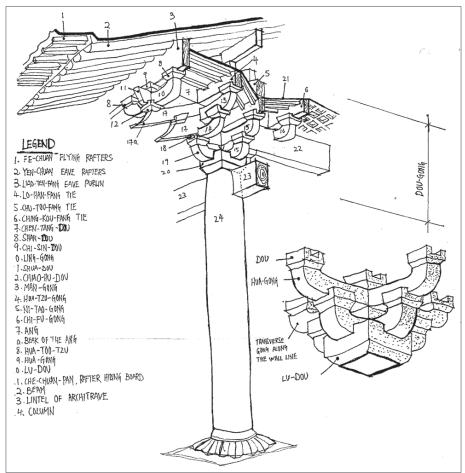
Bracket post and beam construction technique. Source: Drawn by Student Year 3, 2003 Architecture.
